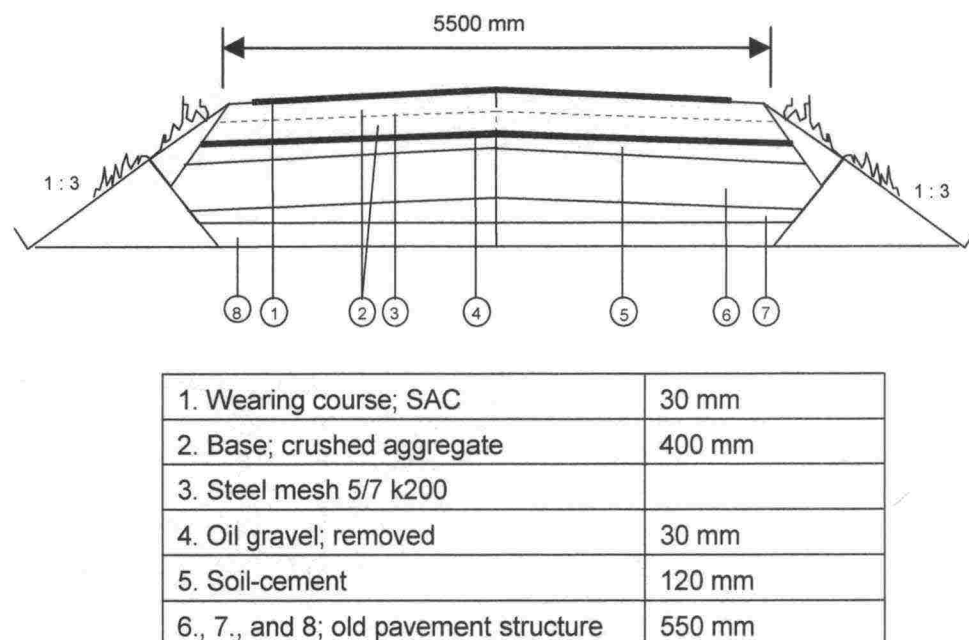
Cross section of the test construction site at Temmes (soil-cement structure)
